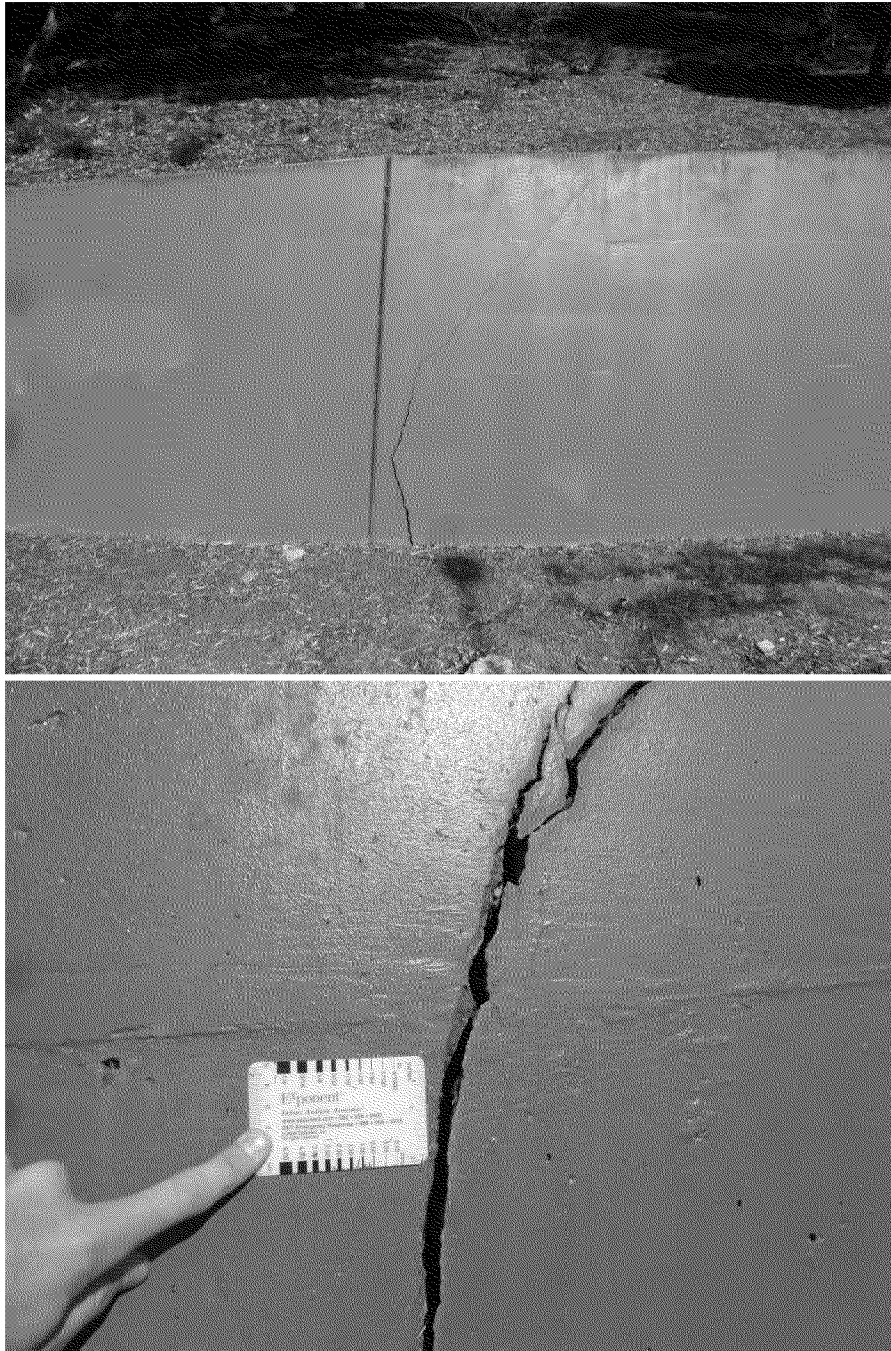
Retaining wall crack, looking north. Photographs by Exponent, December 13, 2013.
